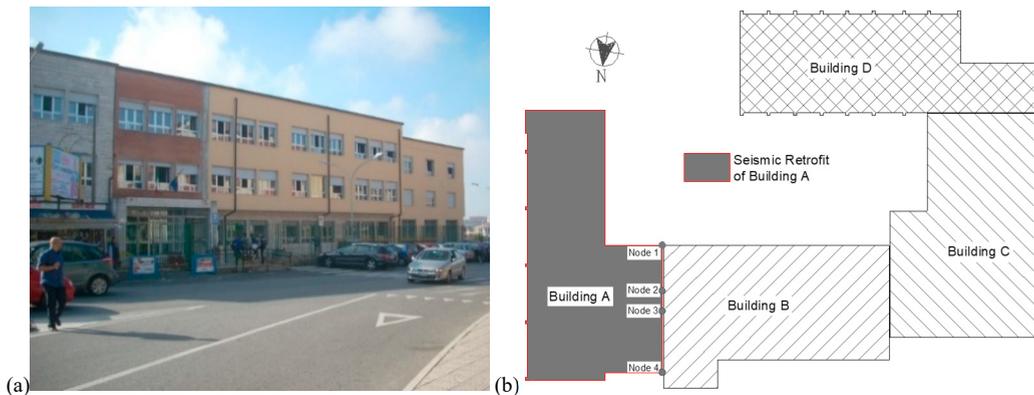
(a) External view; (b) Floor Plan of the Building Structures.
